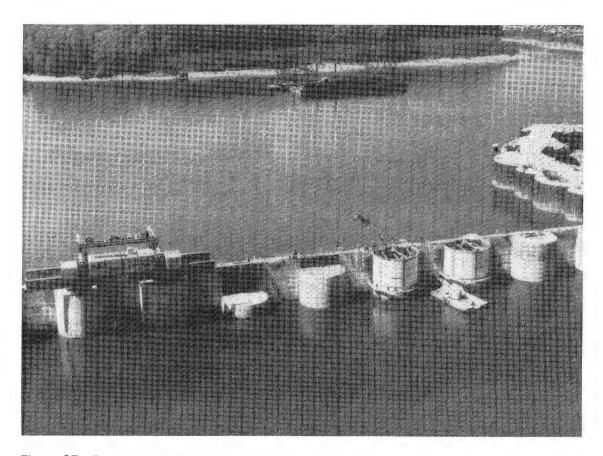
Precast concrete beams installed on downstream guidewall, Melvin Price Main Lock (from *Engineer Update* 1990)
